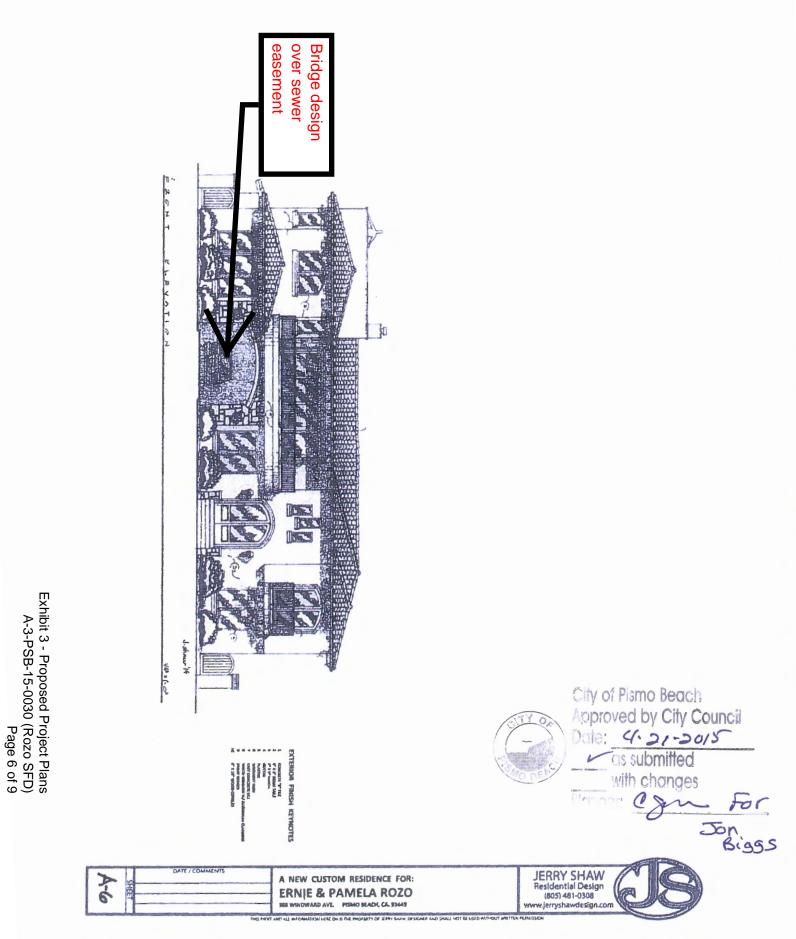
Proposed Project Plans A-3-PSB-15-0030 (Rozo SFD) Page 4 of 9
